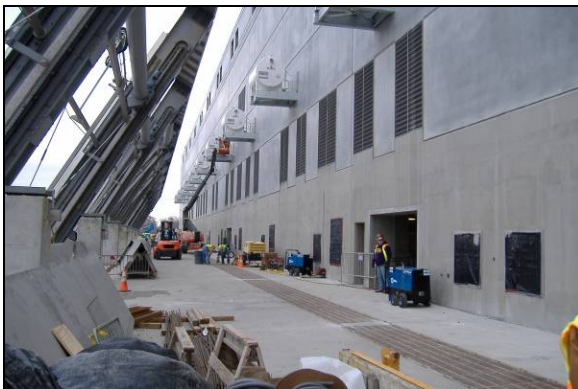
Trash racks (left side) and pump station exterior wall (right side)
